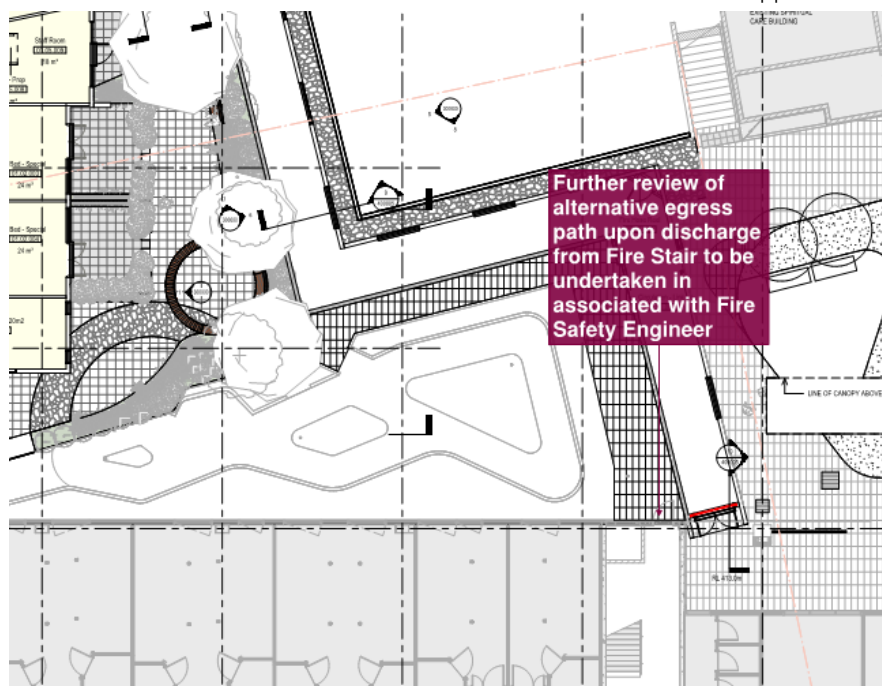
Alternative paths of egress from existing Fire Stair to be further reviewed with the Fire Safety Engineer
